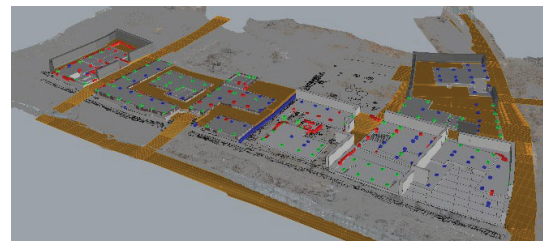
3D Modeling of Foundation Stones and Site Formation.
